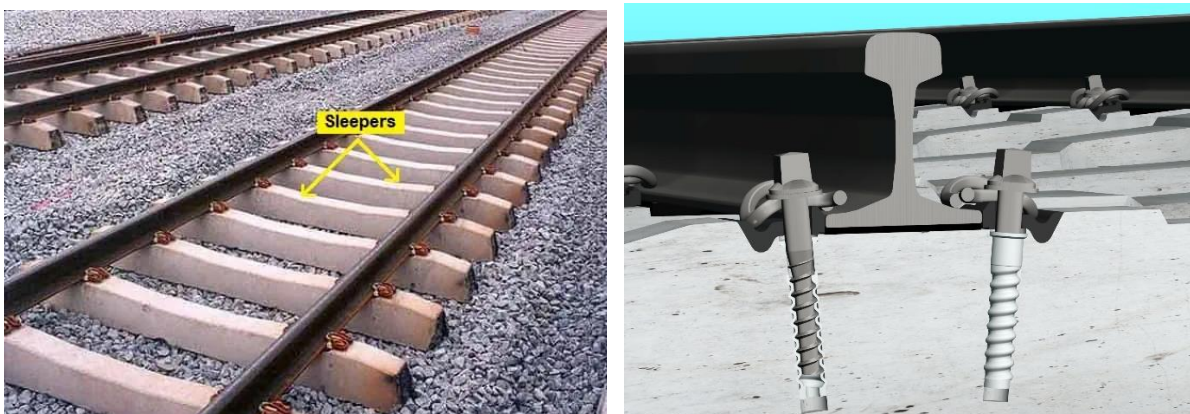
A railway track with rail on concrete sleepers and the rail fastened into the sleeper
